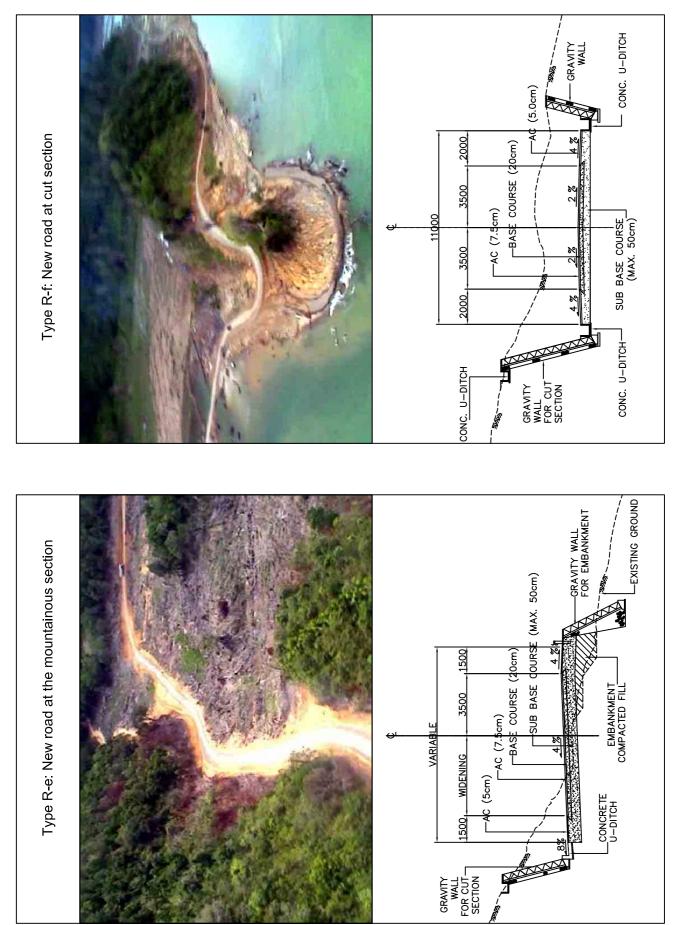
(5/5) TYPICAL CROSS SECTIONS
